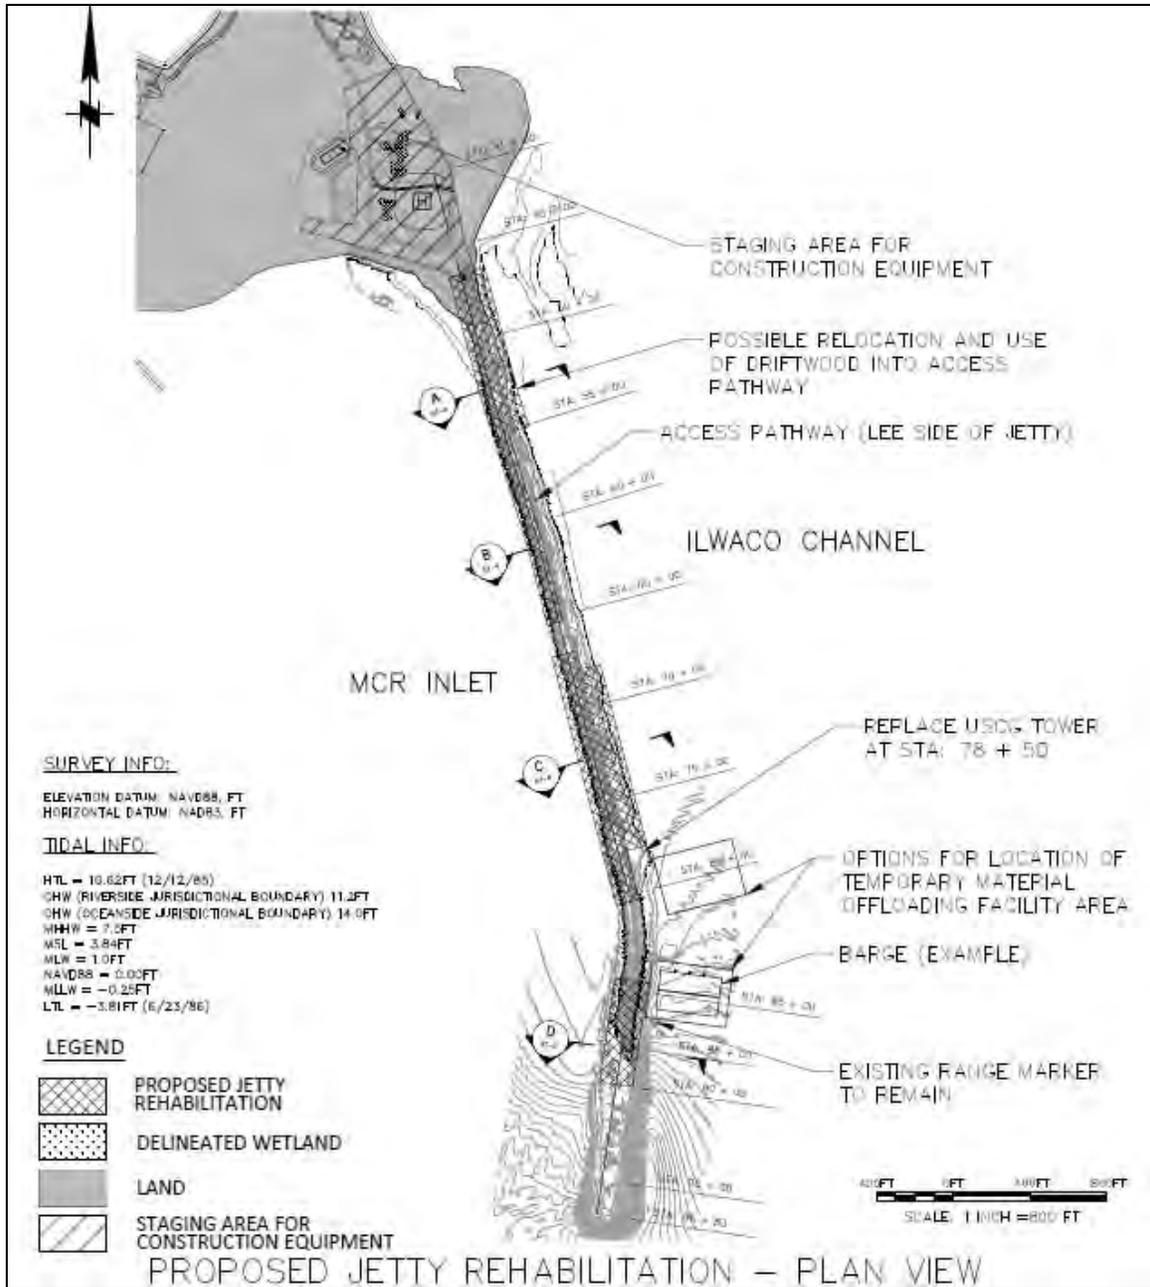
Jetty A Repair & Access Road Concept Plan - Overview
